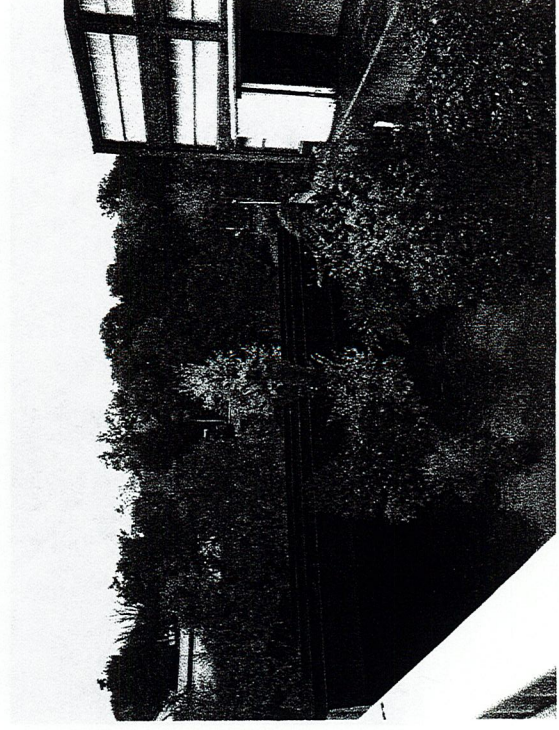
Looking upstream from the Putnam Street Bridge towards the Railroad Bridge
